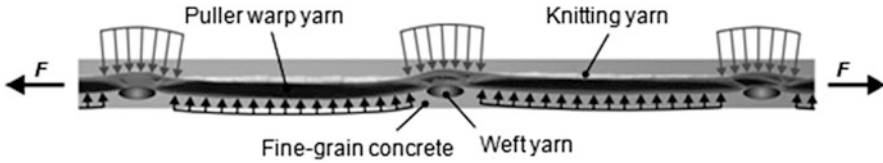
Transverse tensile forces in concrete caused by deflections of the reinforcement yarns, at the risk of delaminations and concrete spalling [65]
